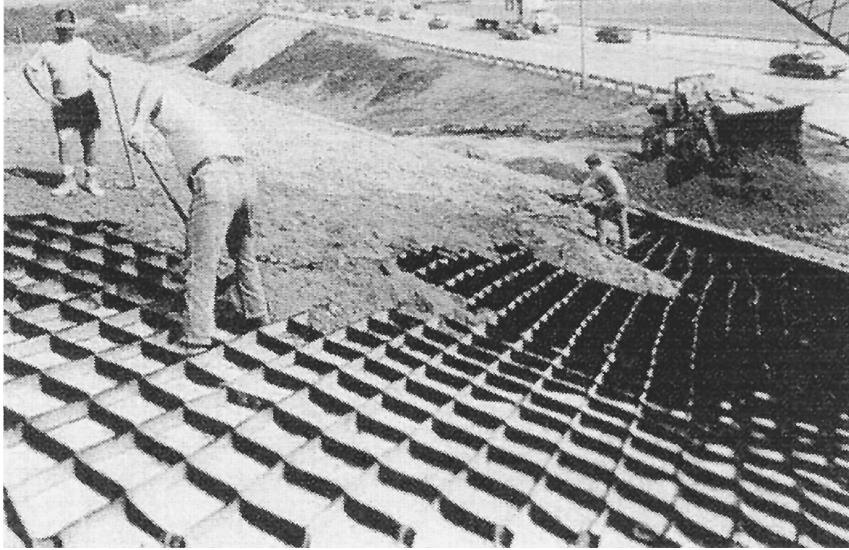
View of expanded geocell. (Photo courtesy of Presto Products Company.)
